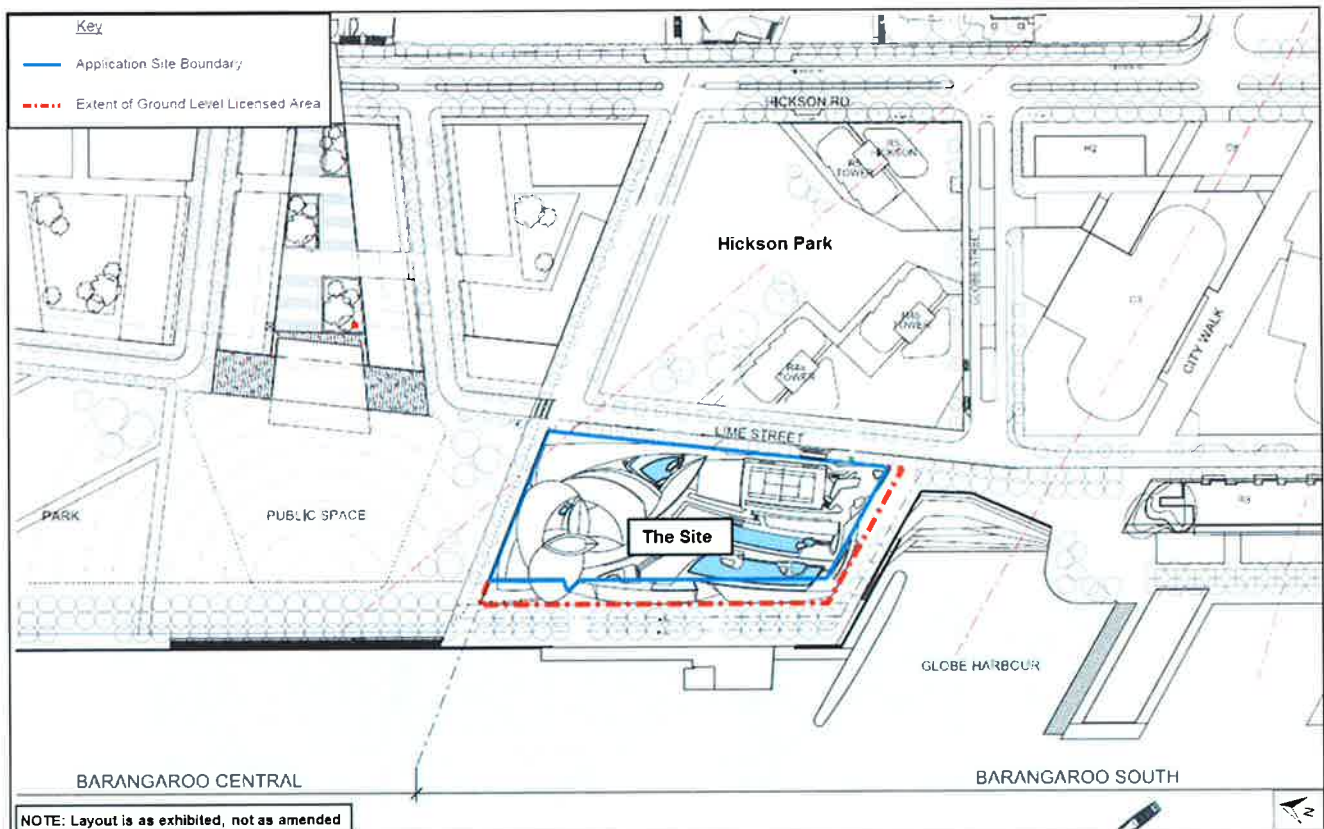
The subject site and its proposed future surrounding context (Base source: Applicant's EIS – as exhibited)
